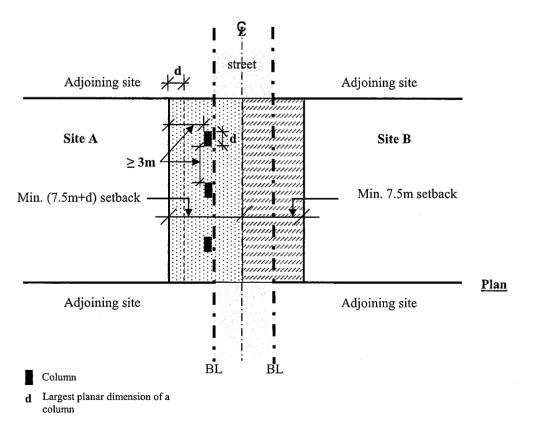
Building setback as detailed in paragraphs 7(a) and 8(c)
